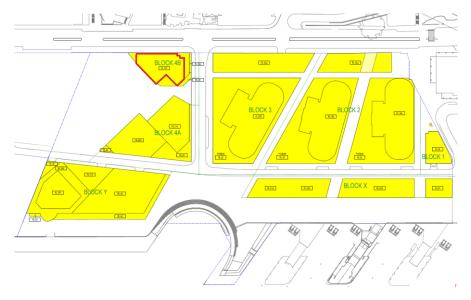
Building R5 (red outline) in relation to the Concept Plan (Mod 8) Indicative Building Layout
